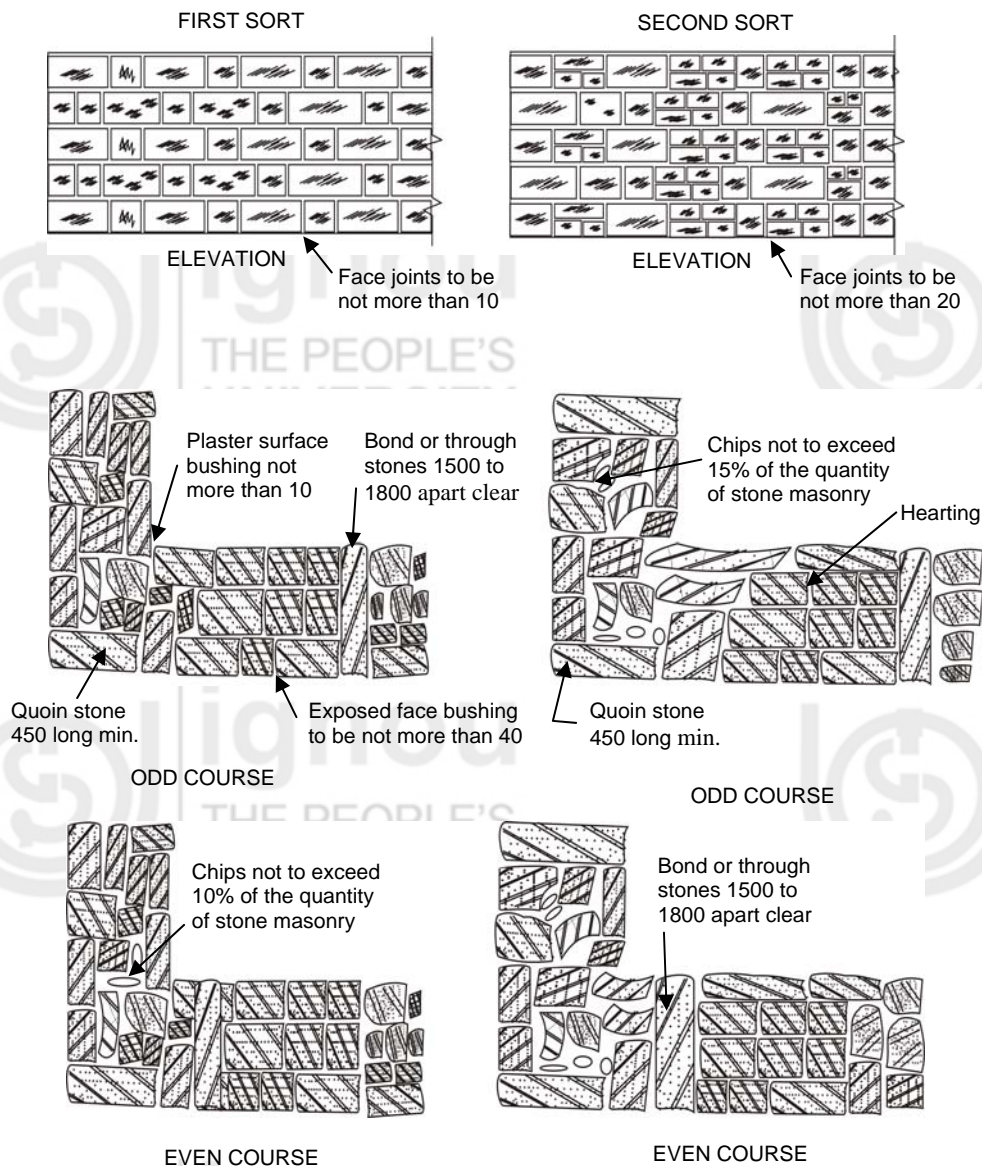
Coursed Rubble Masonry (All Dimensions are in mm)
